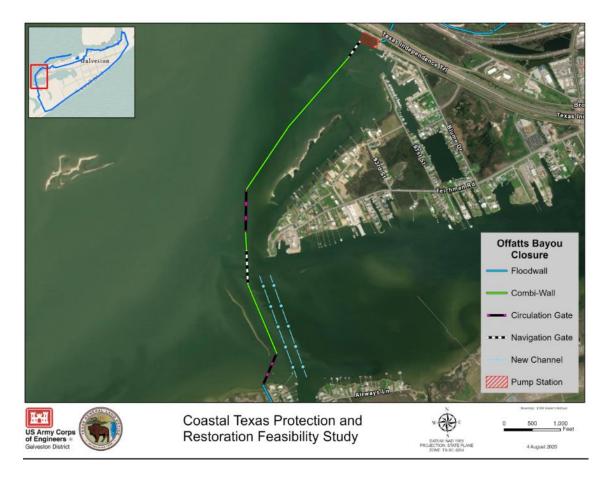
Offatts Bayou Crossing (See Annex 17 for Details)
